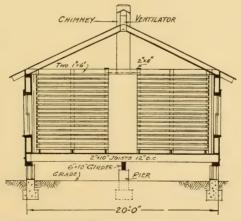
Cross section of a 20 by 40 foot sweet-potato storage house. Note space under bin and between bin and walls of house. (Courtesy, U. S. Department of Agriculture).
